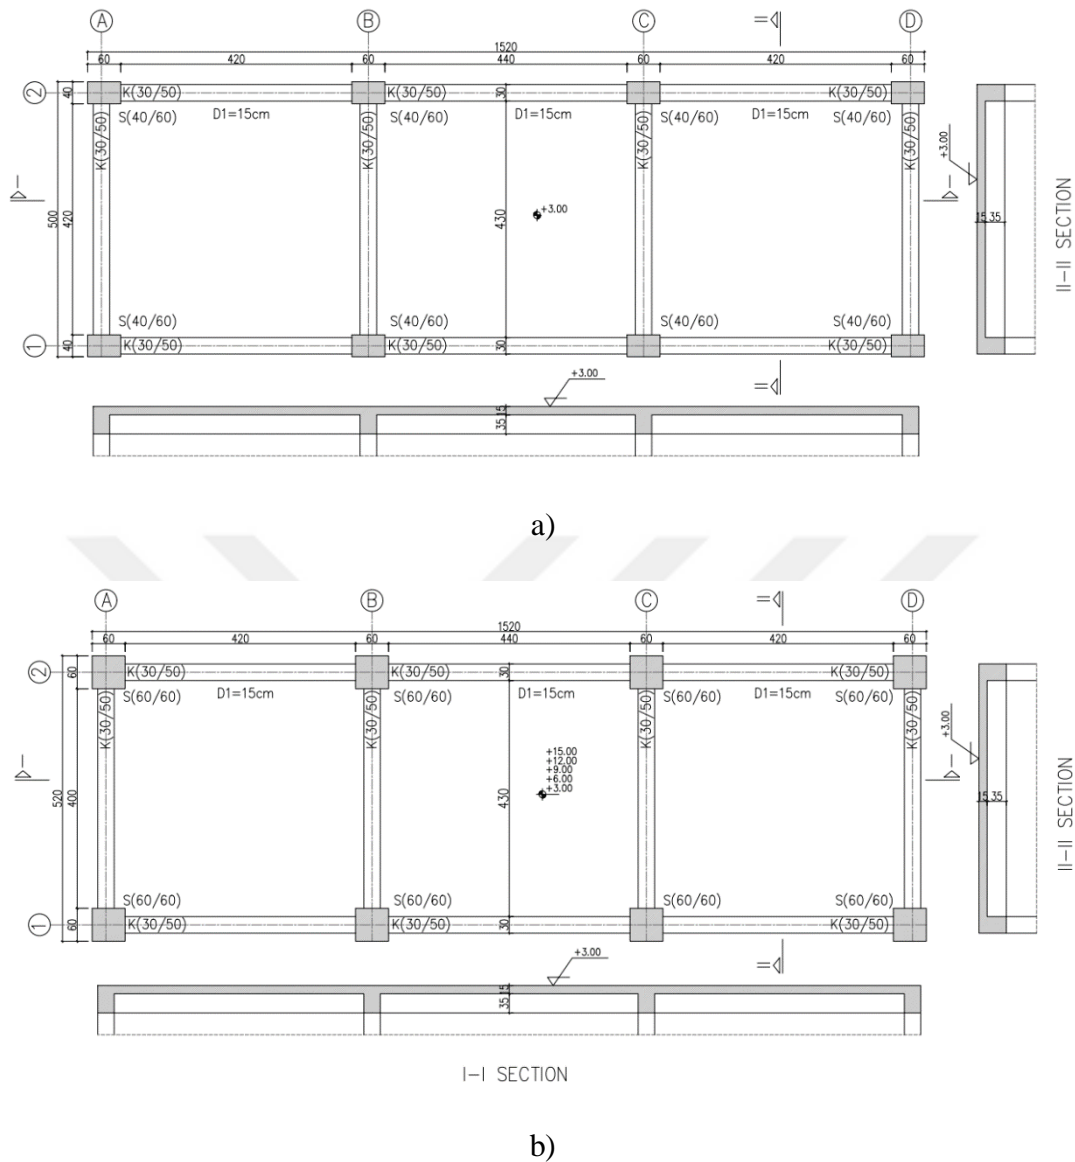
The typical floor plan of (a) low-rise building (b) mid-rise building
